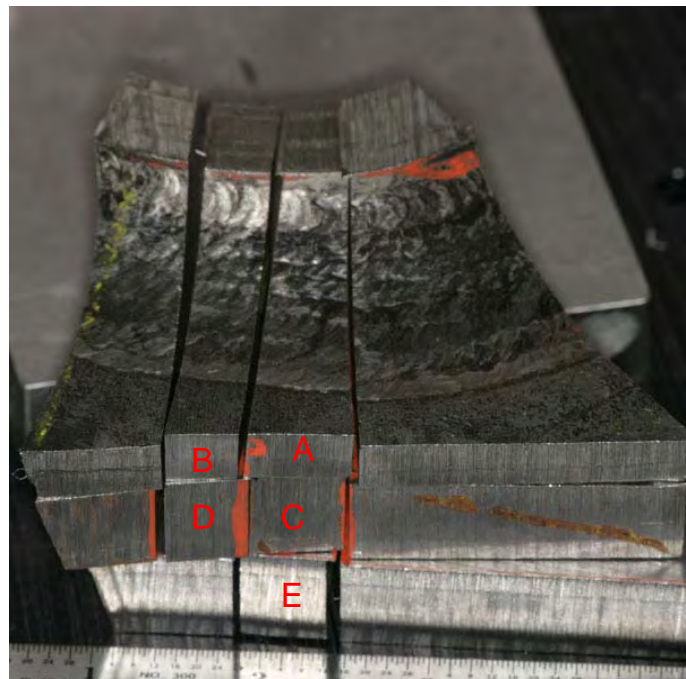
Section 2 After Cutting to Find Cracks
